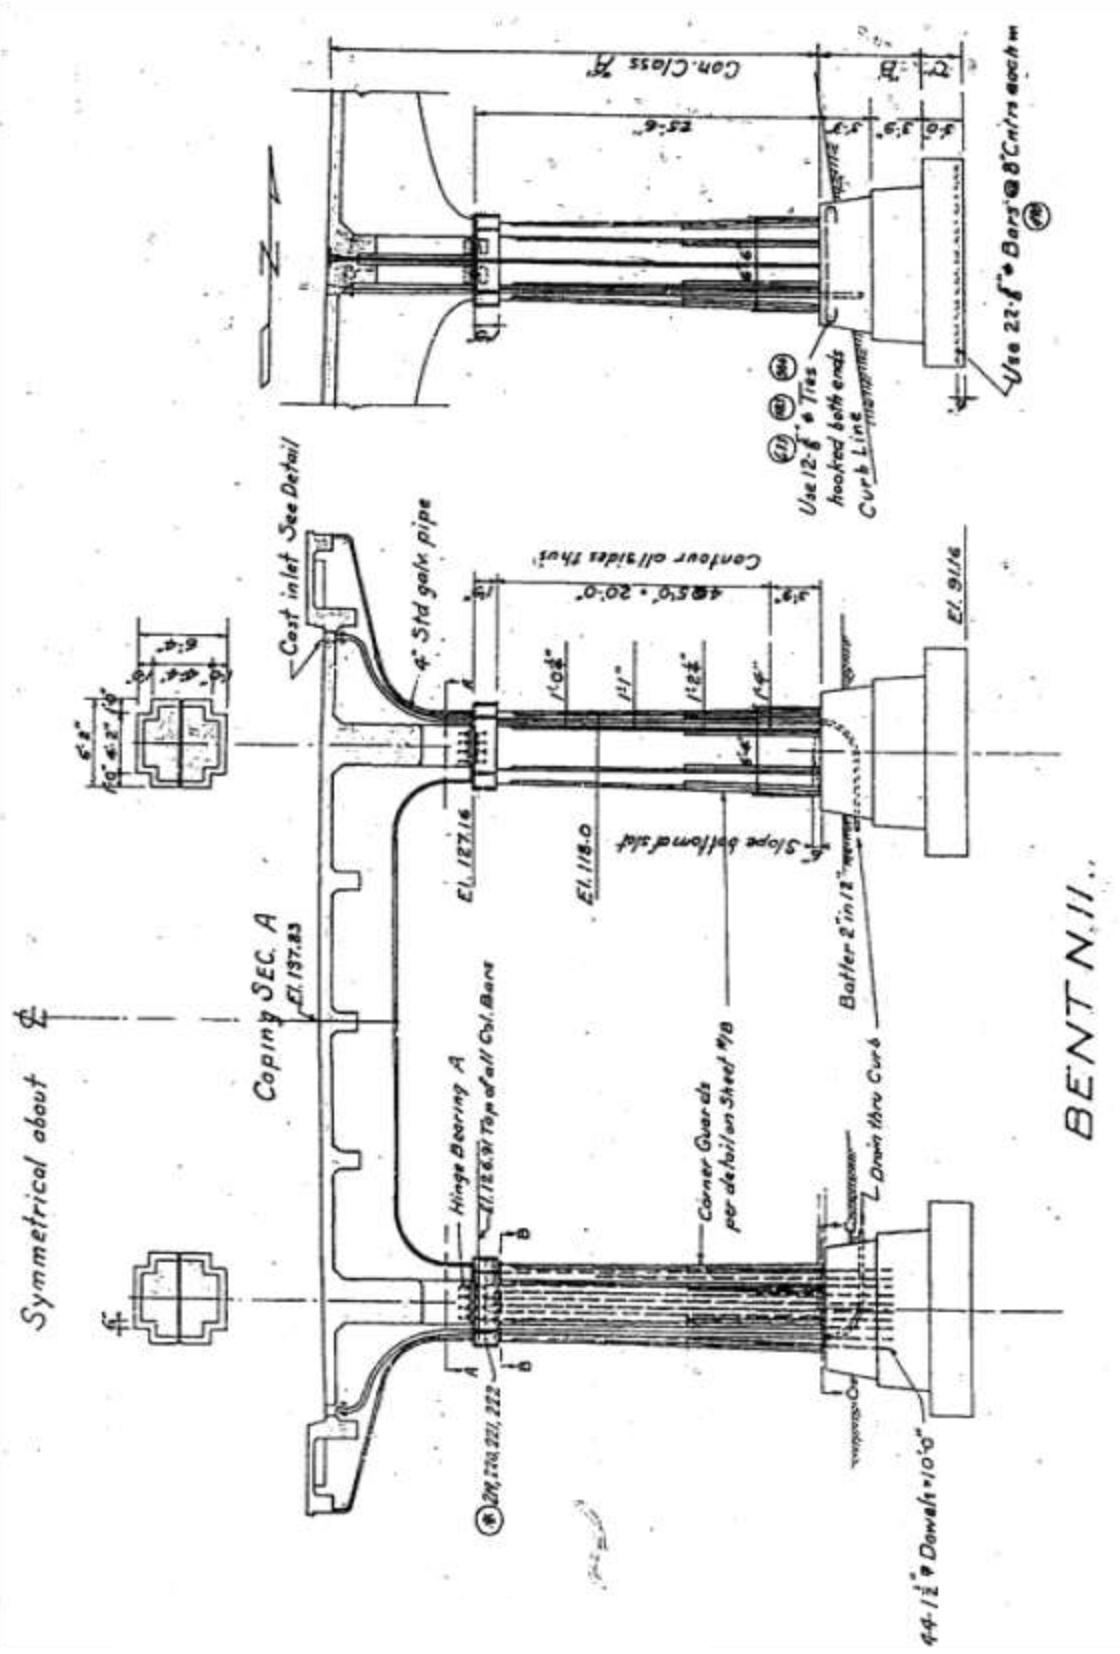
Split Column As-Built Details (1 in. = 25.4 mm)
